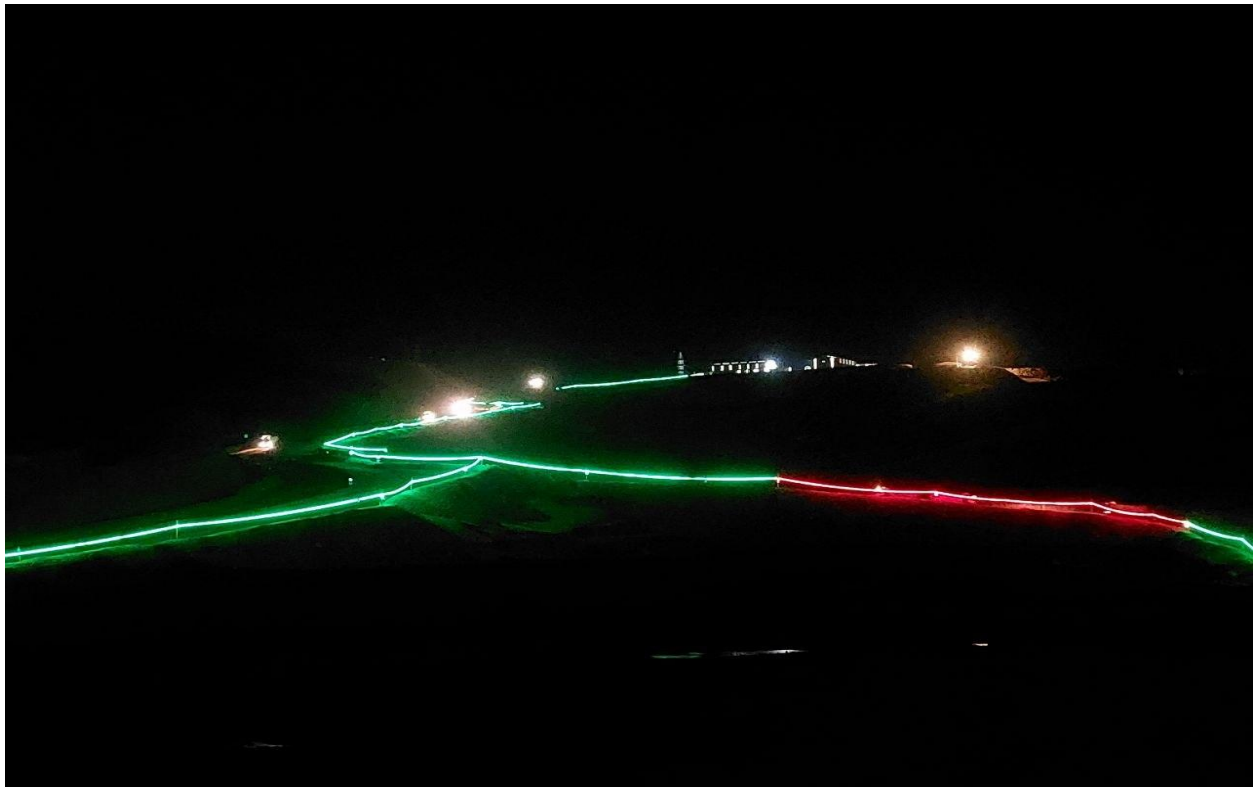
Proposed LED Strip Lighting System for Open-Pit Mine Haul Roads
